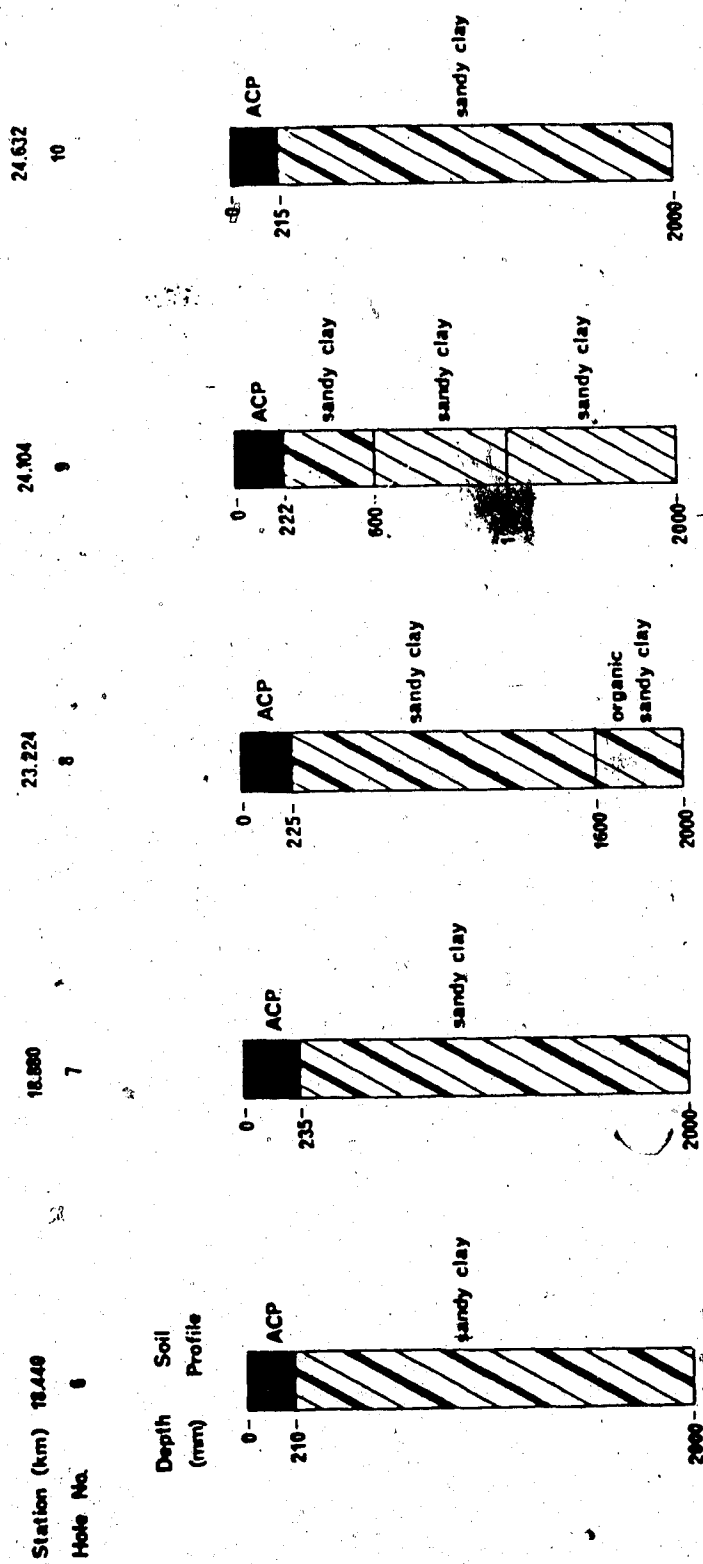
Project SR 845:02-2 (Medium Cracking Section)
